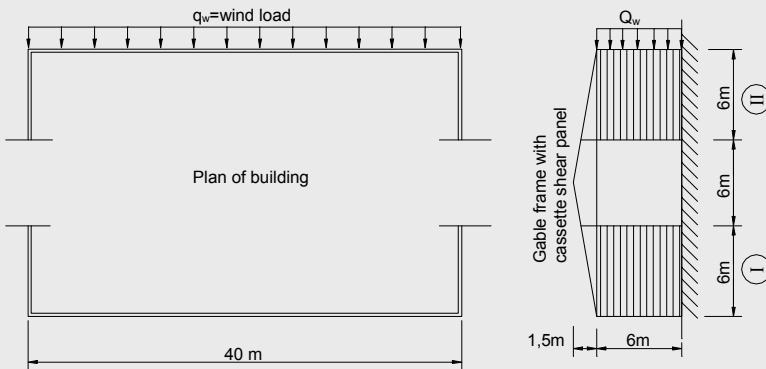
Pitch roof industrial building: plan and gable frame
